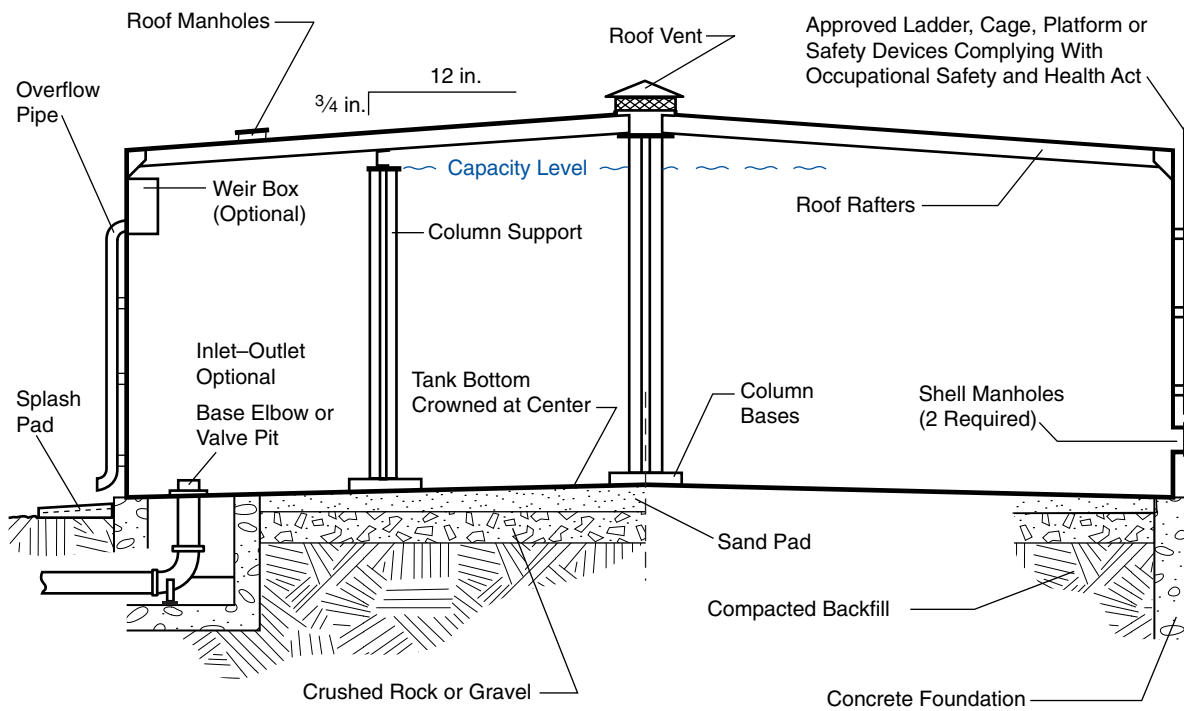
Cross-sectional view of a welded steel reservoir
